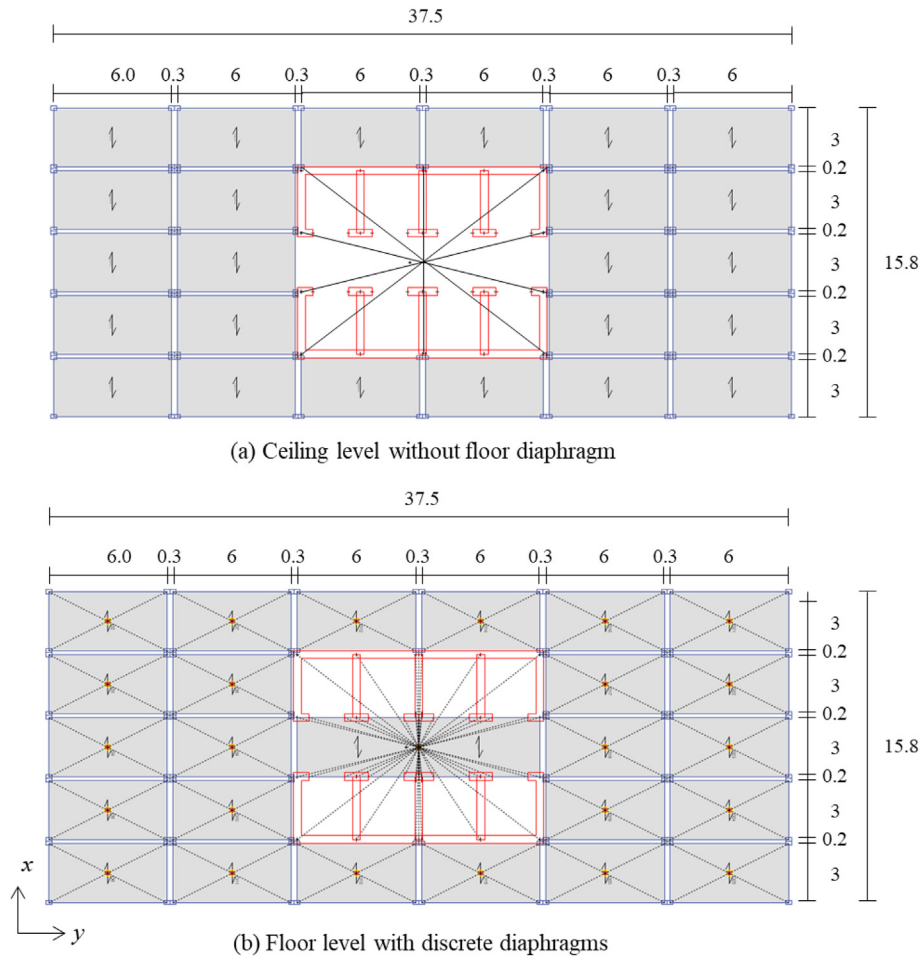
Plan view of 40-storey modular building with reinforce concrete (RC) core (a) ceiling level, and (b) floor level (all units in m) [9].
